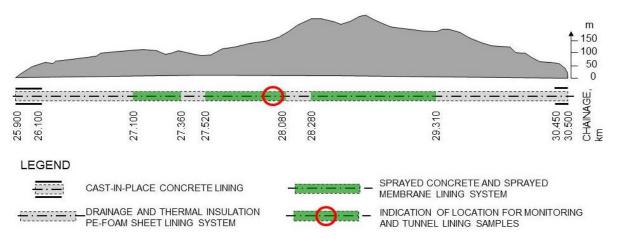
Longitudinal section of the Gevingås rail tunnel, total length 4100 m, showing the different constructed lining types [6]
